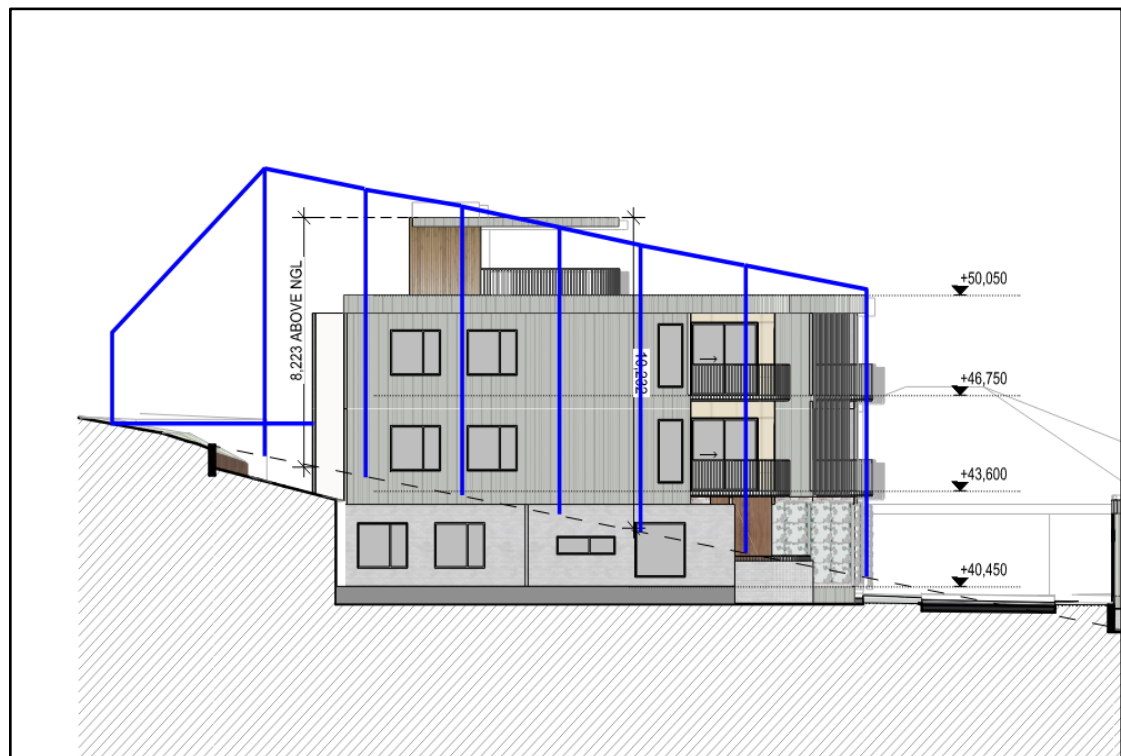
North elevation relative to building envelope determined by Eastern side boundary adjoining 22 Gale Street.
